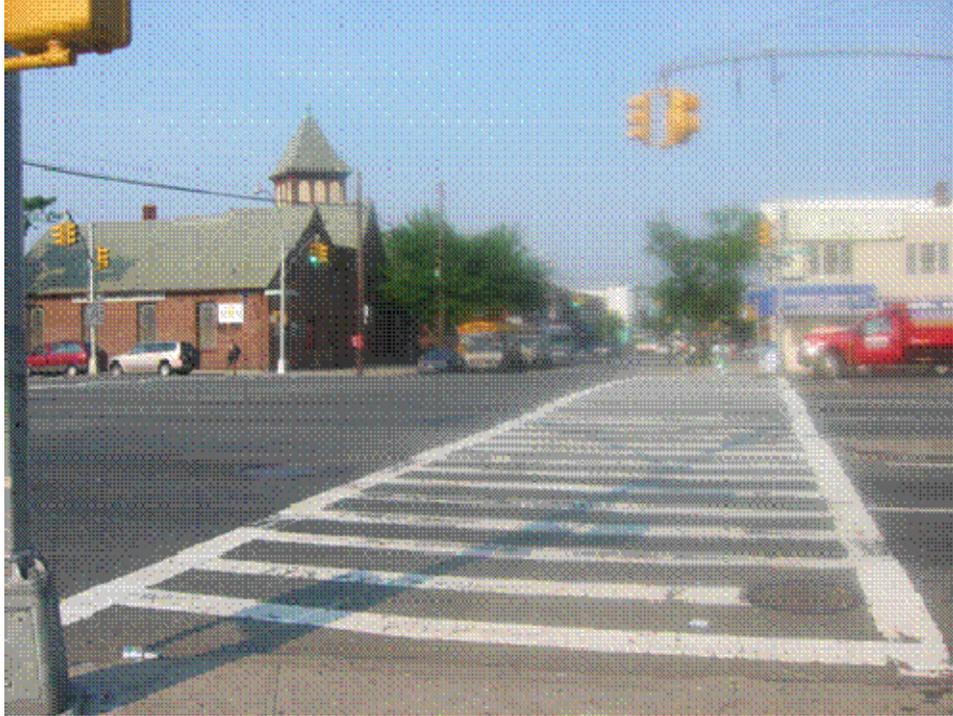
Looking south on 94<sup>th</sup> Street toward the intersection with 101<sup>st</sup> Avenue
